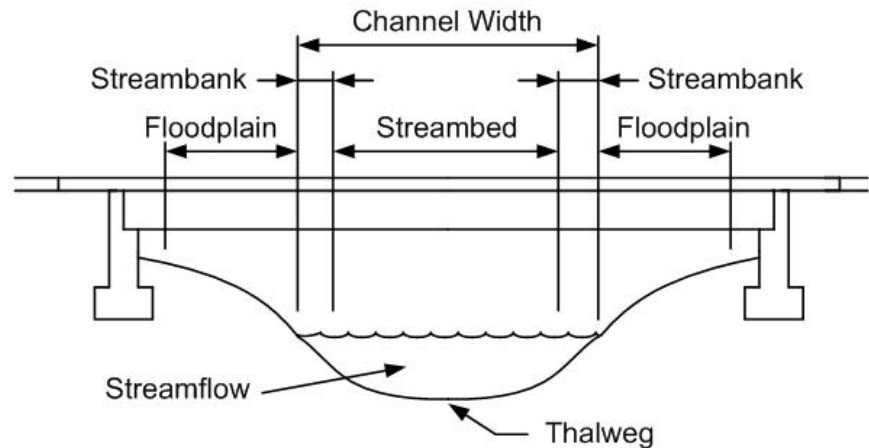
Typical Waterway Cross Section Showing Well Defined Channel Depression
